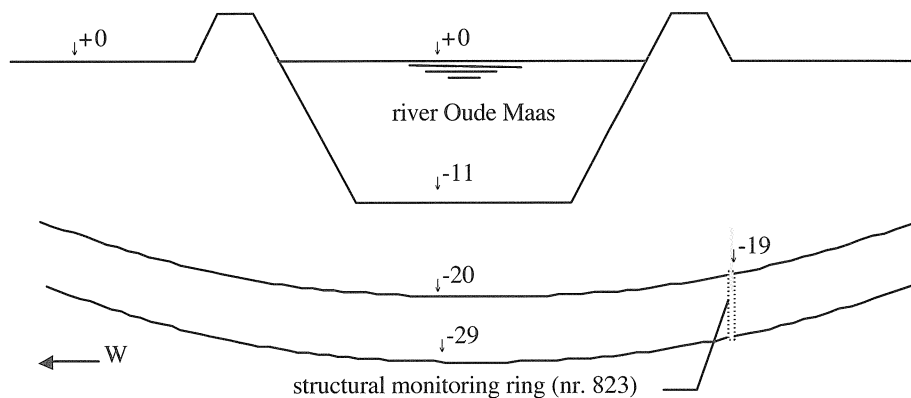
Longitudinal cross-section of the Botlek railway tunnel.
